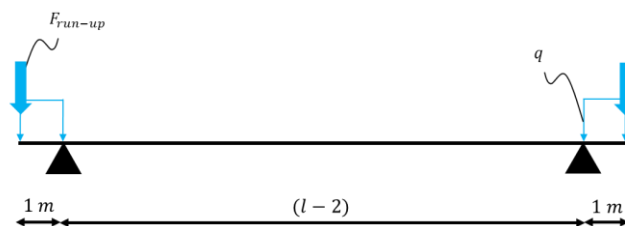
LC 4: Mobile loading on the cantilevers of the bridge
